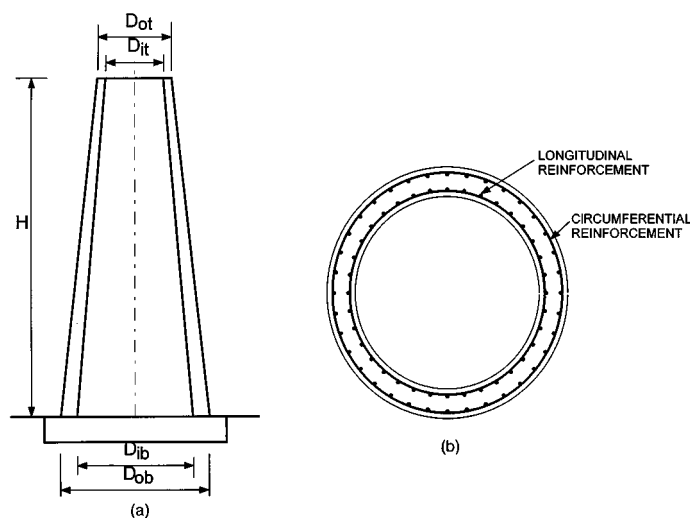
Typical reinforced concrete stack-like structure: (a) stack; (b) cross-section
